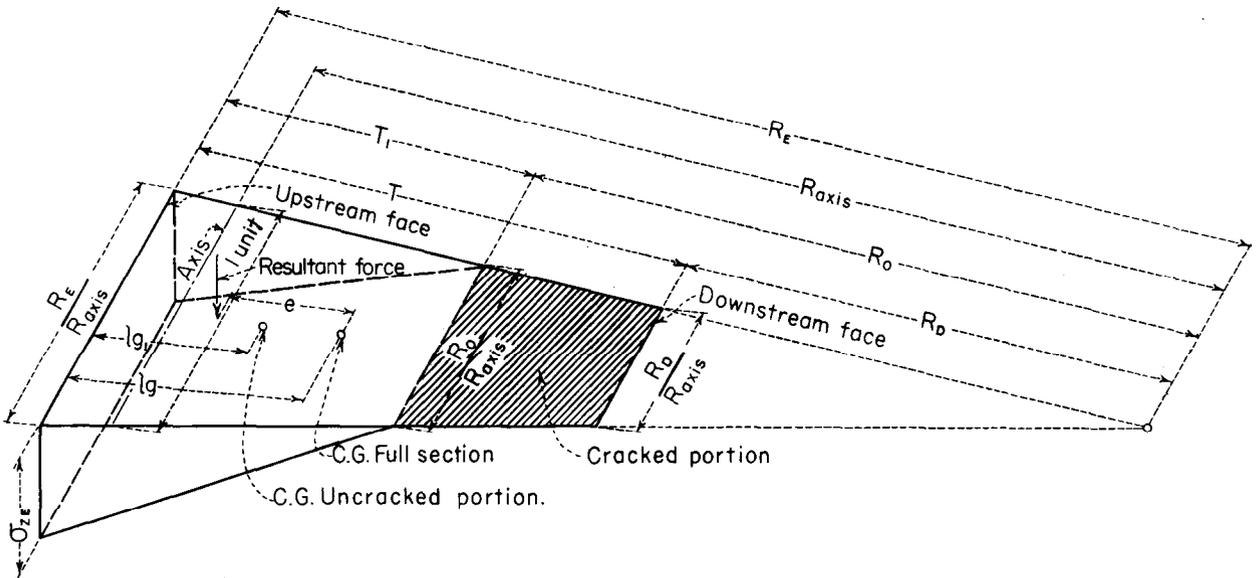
Horizontal section of a cantilever cracked from the downstream face (assuming linear stress distribution).—288-D-2979
